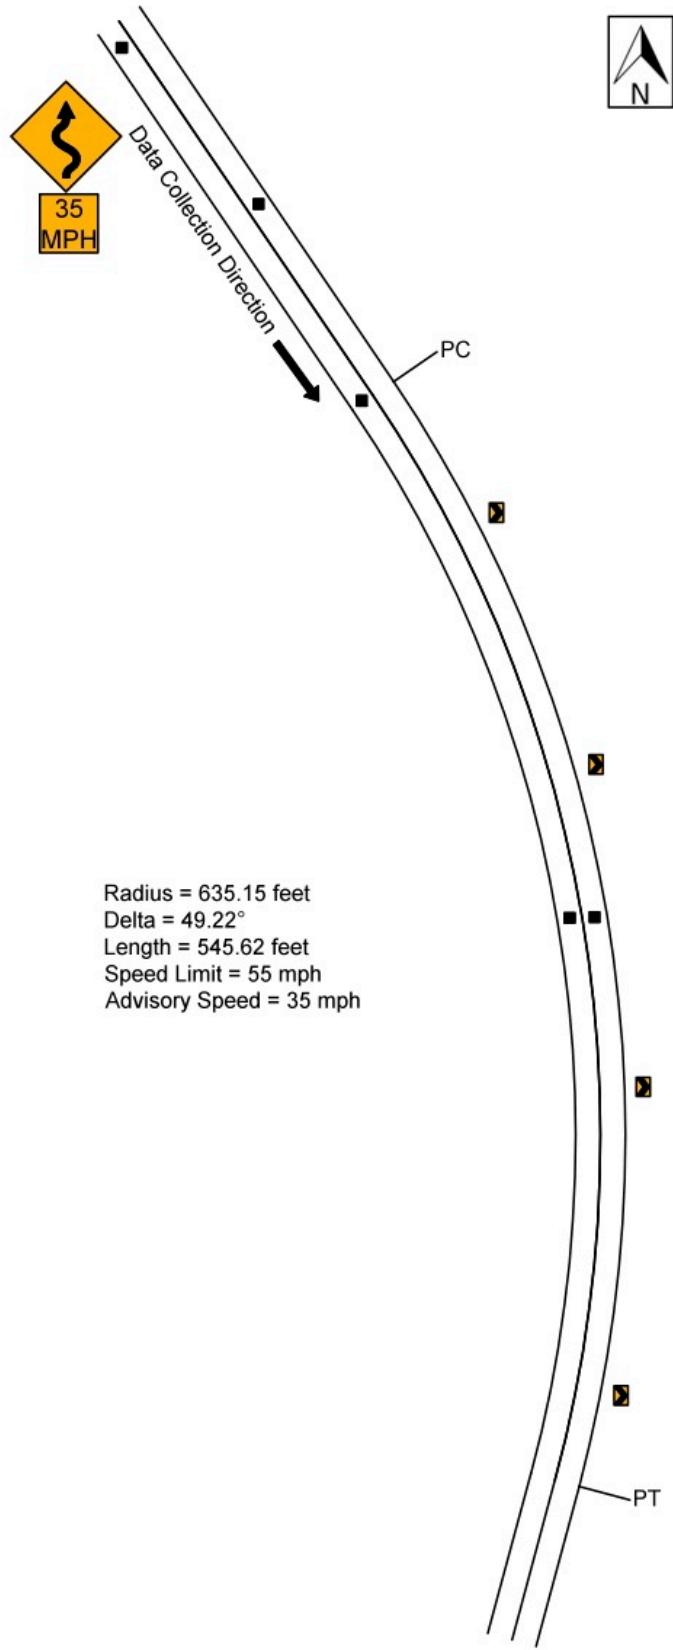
Diagram. Geometric layout of Alabama Location #3 (not to scale).
